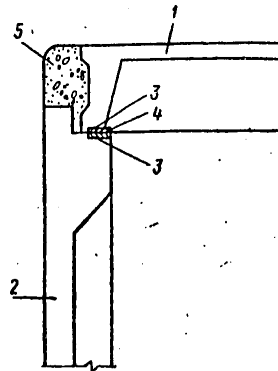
Welded connection of precast reinforced concrete elements of walls and overhead cover
